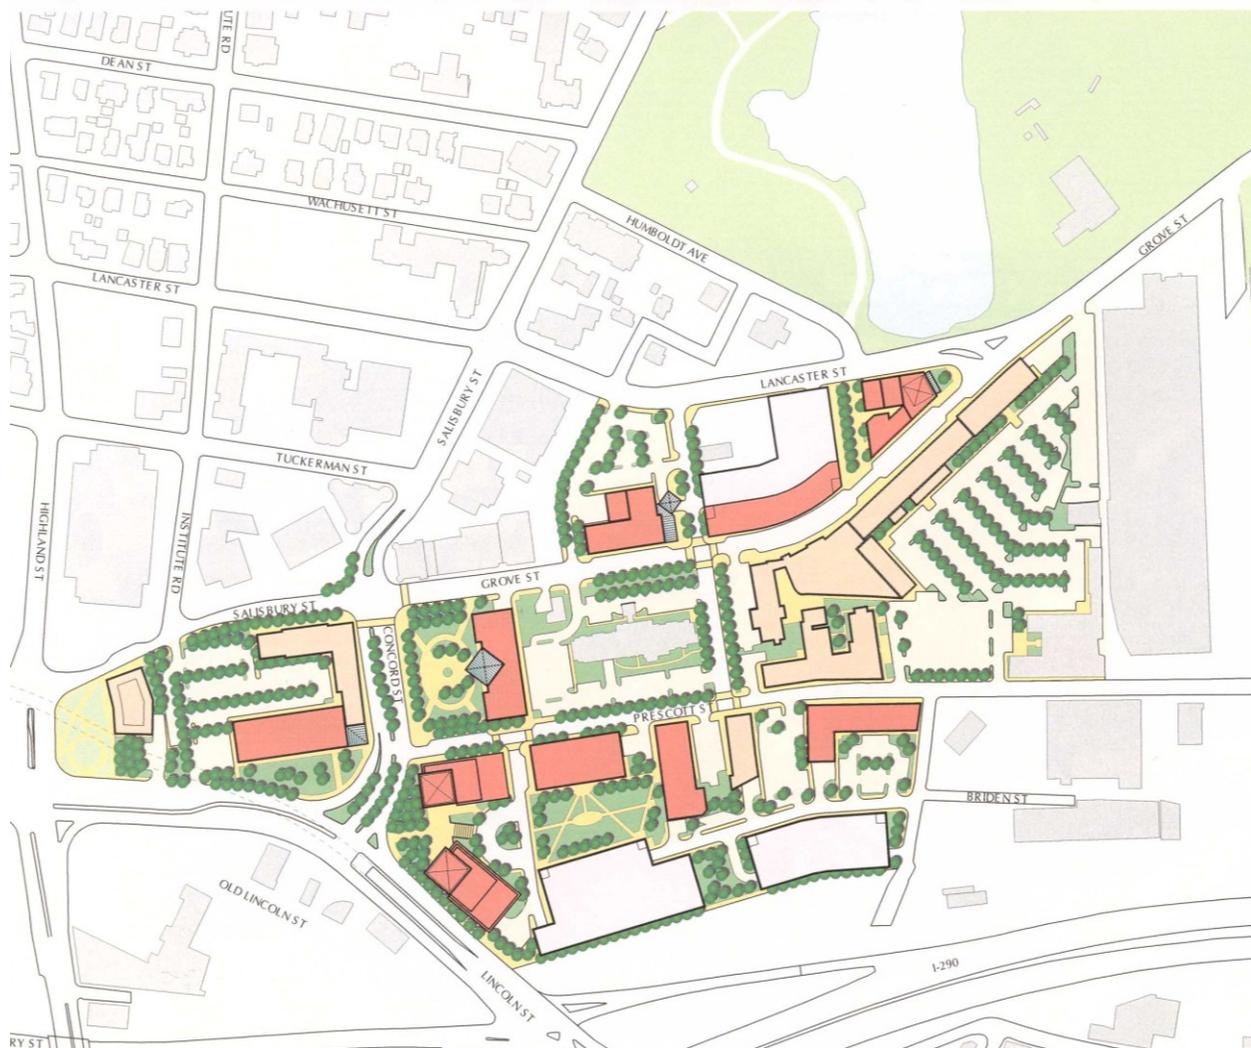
Gateway Park Plan From: Wallace Floyd Design Group
